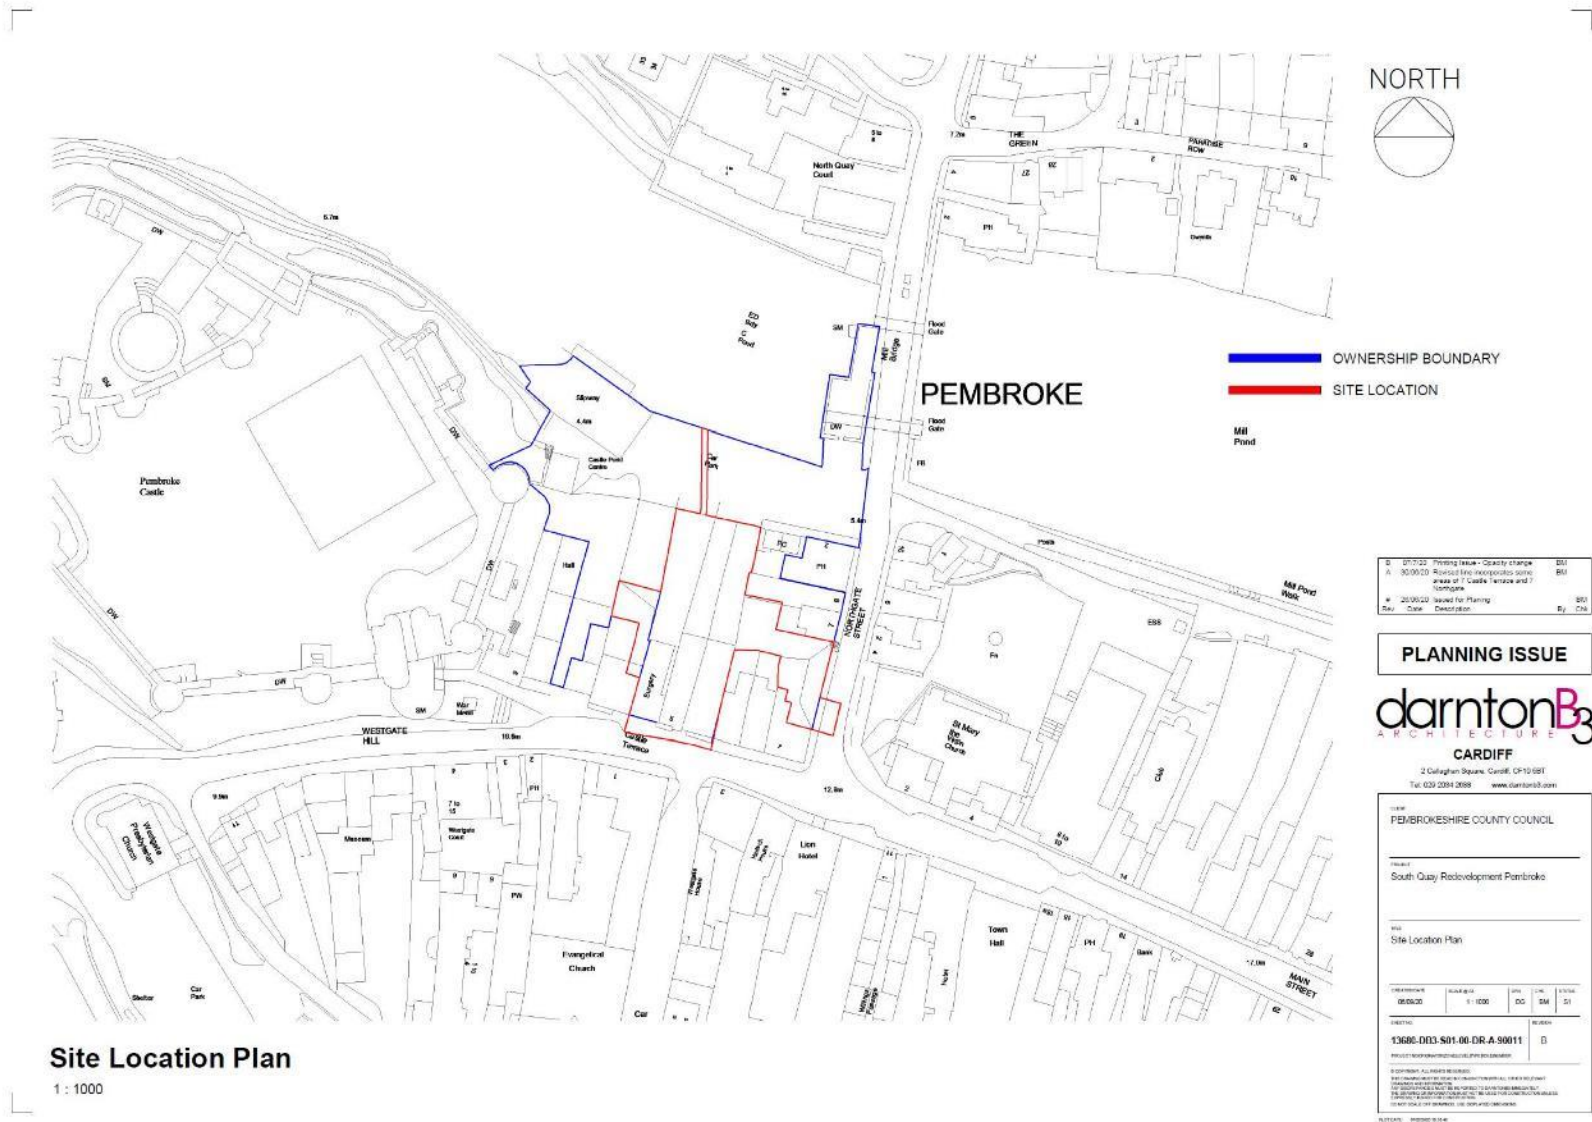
Plan of the development area outlined in red (Darnton B3 Architecture).
